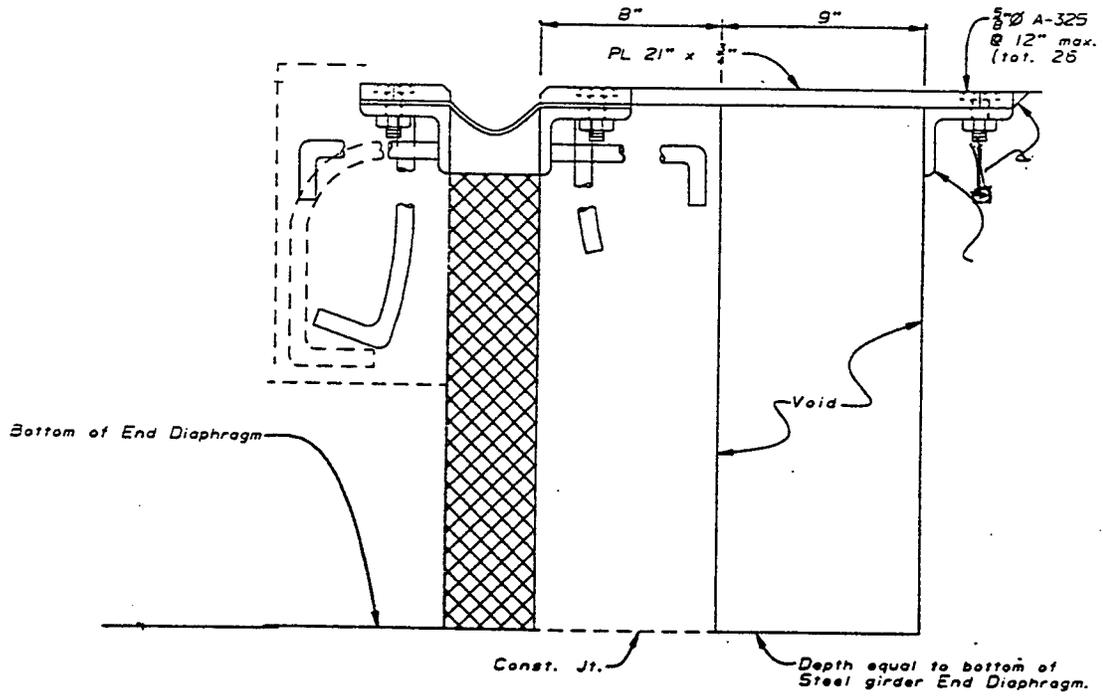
Abutment Backwall Knock-off Devices
